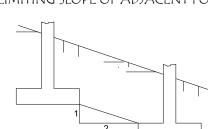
DETAIL OF LIMITING SLOPE OF ADJACENT FOOTINGS
